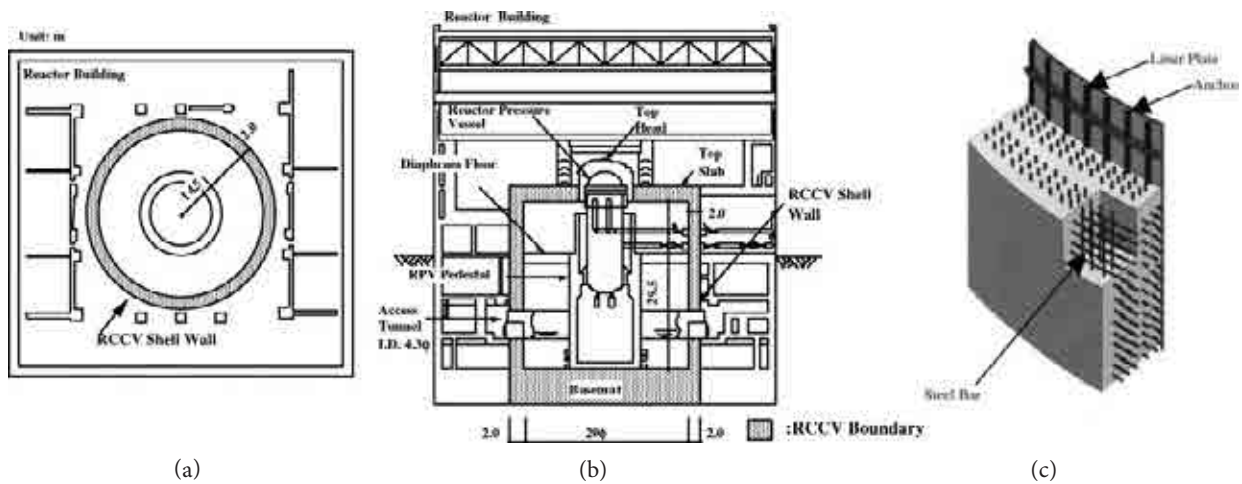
(a) ABWR reinforced concrete containment vessel top view³; (b) side view³; (c) section of RCCV wall [597].
